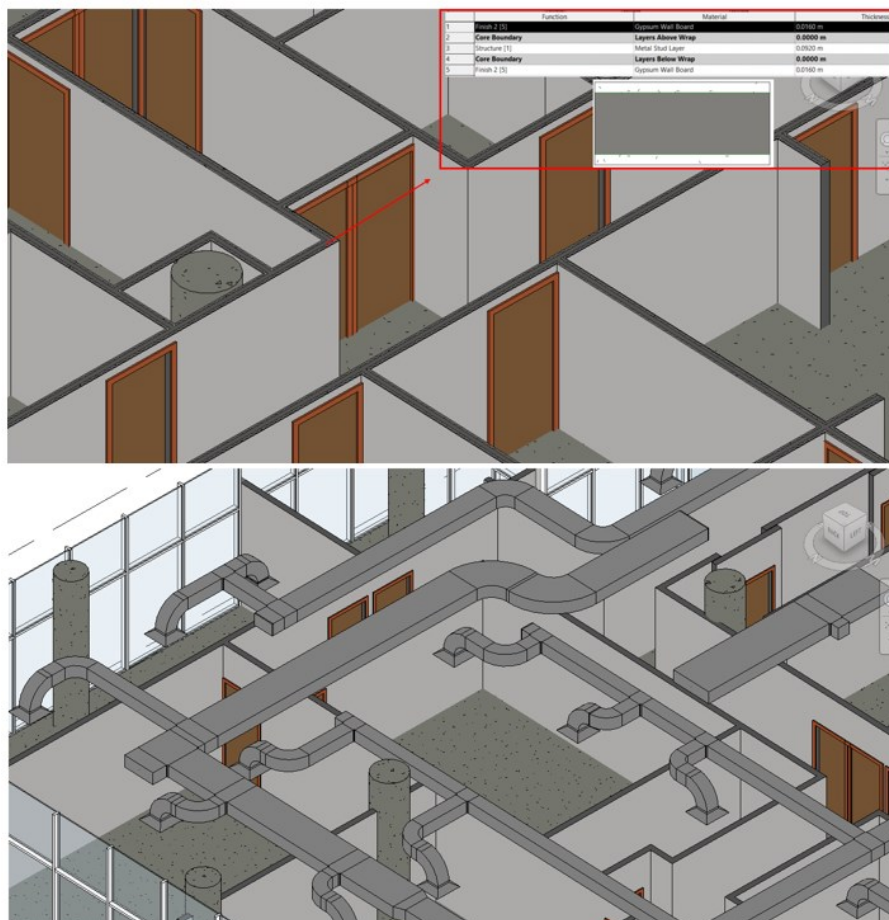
36. The developed details of the wall-partitions, HVAC system etc. demonstrated in EV building BIM model in Autodesk Revit
